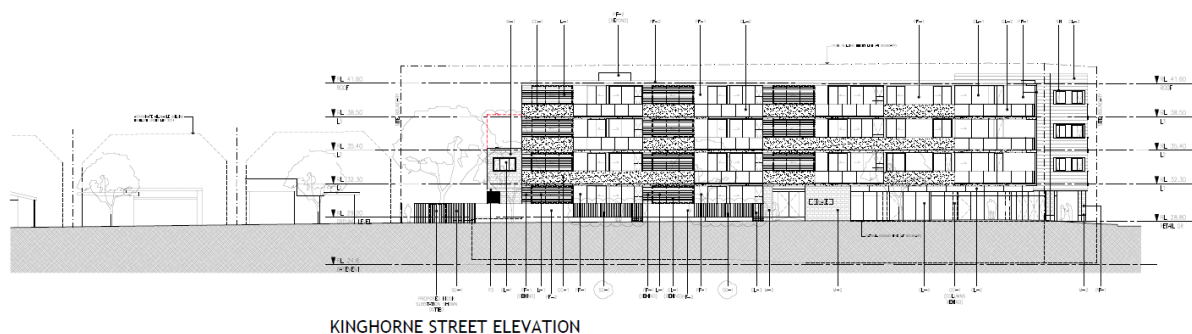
Elevations of the proposed development (eastern elevation – Kinghorne Street).
